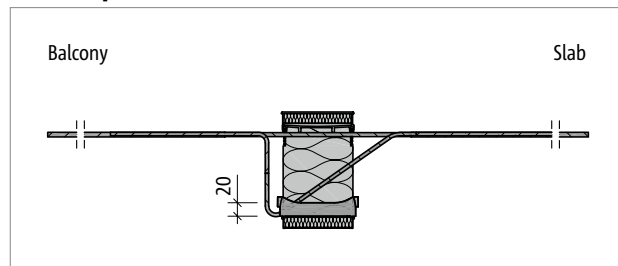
Schöck Isokorb® XT type K-M1 to M4: Product section
